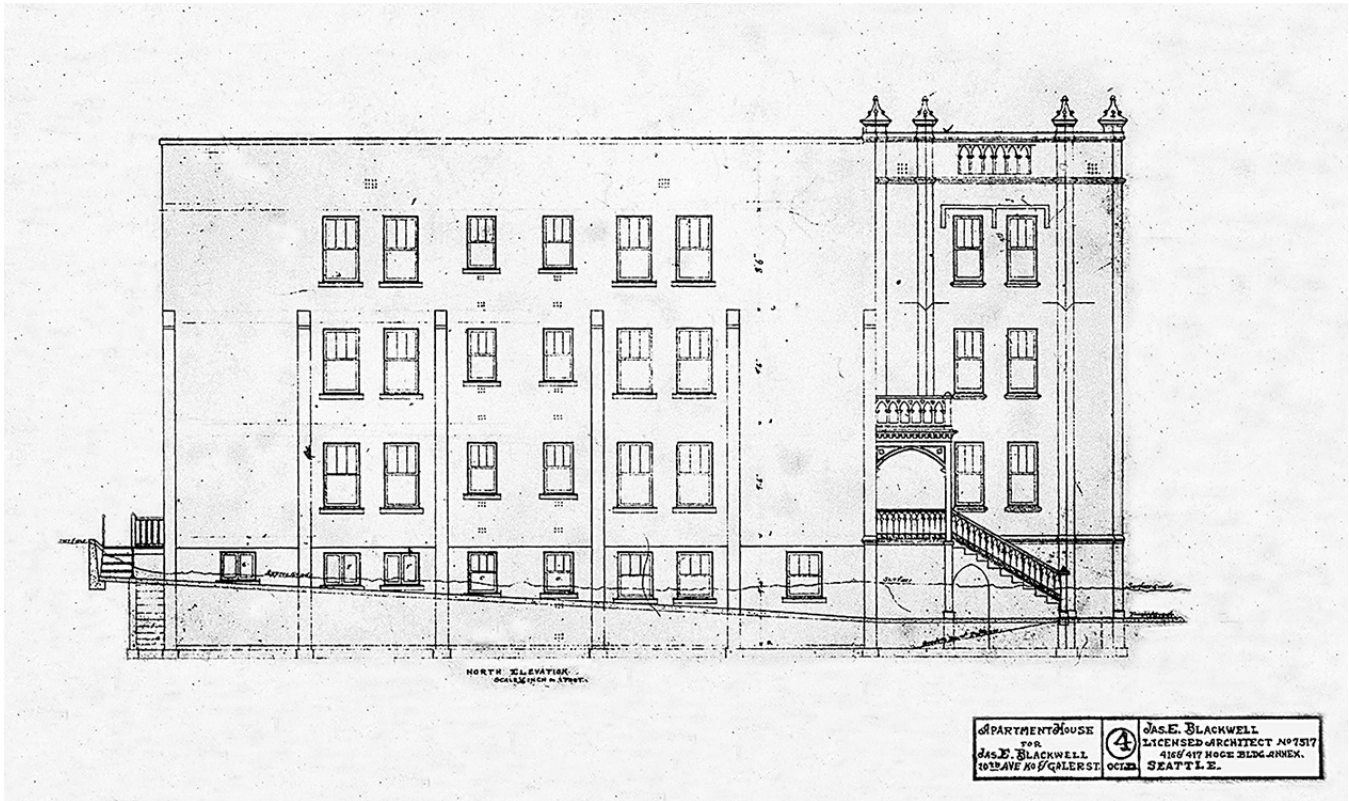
Original 1922 Blackwell blueprint showing the north elevation
